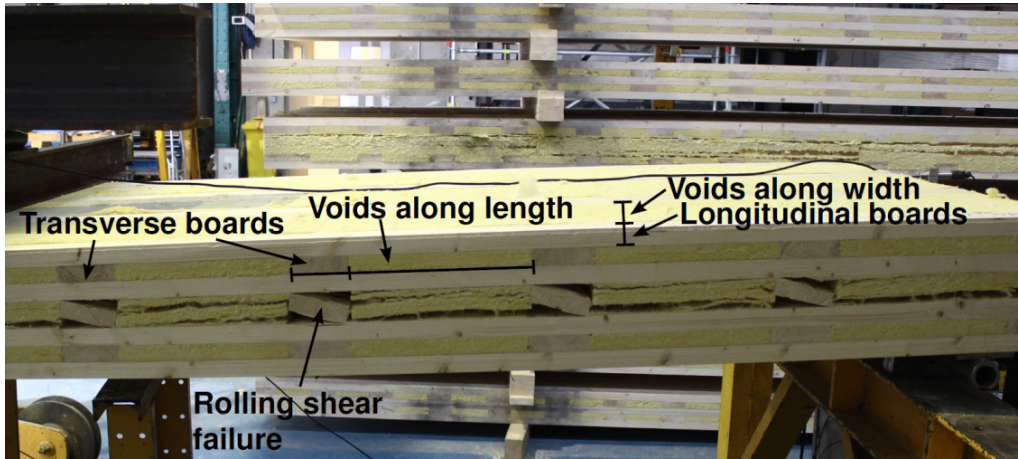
Rolling shear failure of transverse boards of spaced timber floors (Panel-2) in bending
